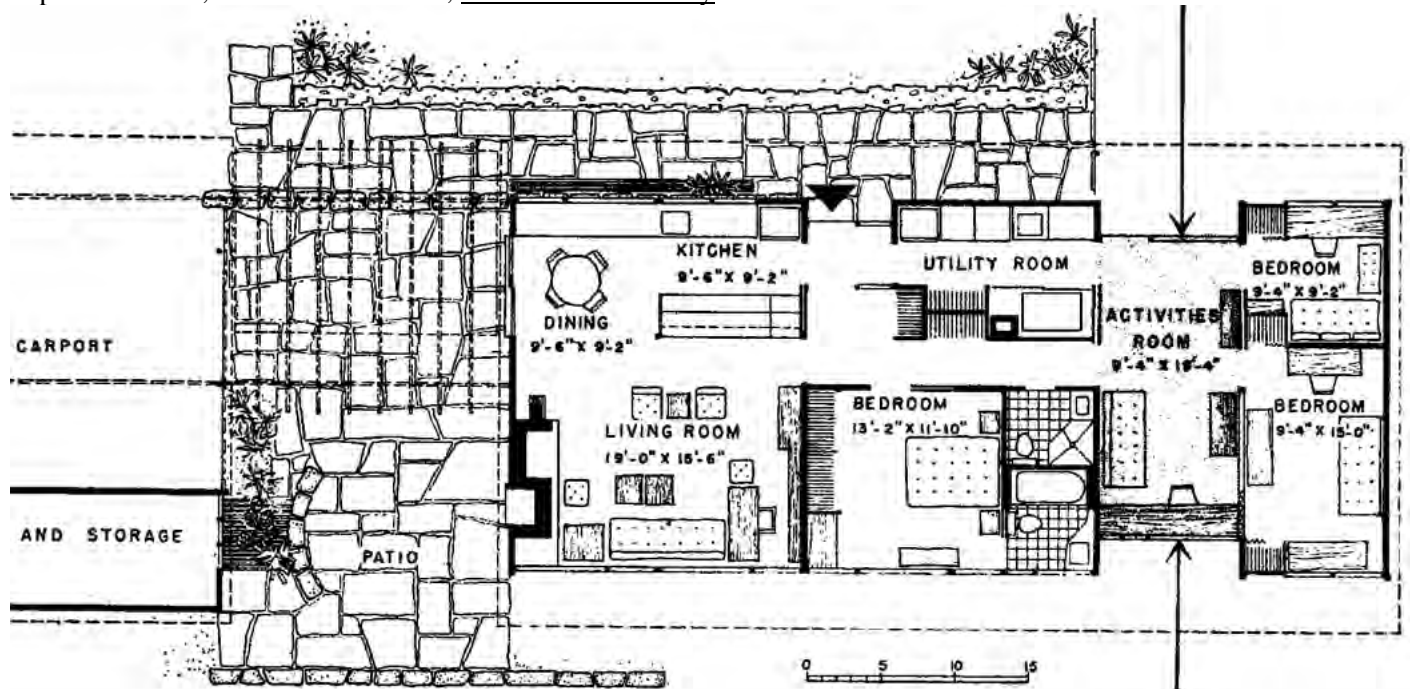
Floor plan and drawing of the NAHB Trade Secret's house: Source: *House & Home*, January 1953, from US Modernist, USModernist Library.
